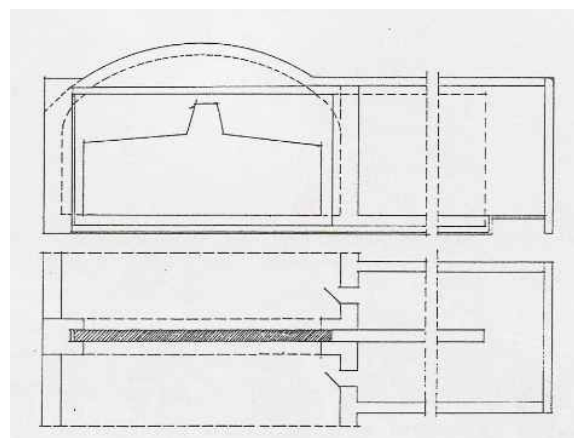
Sketch of reinforced concrete door at the entrance to the underground facility
